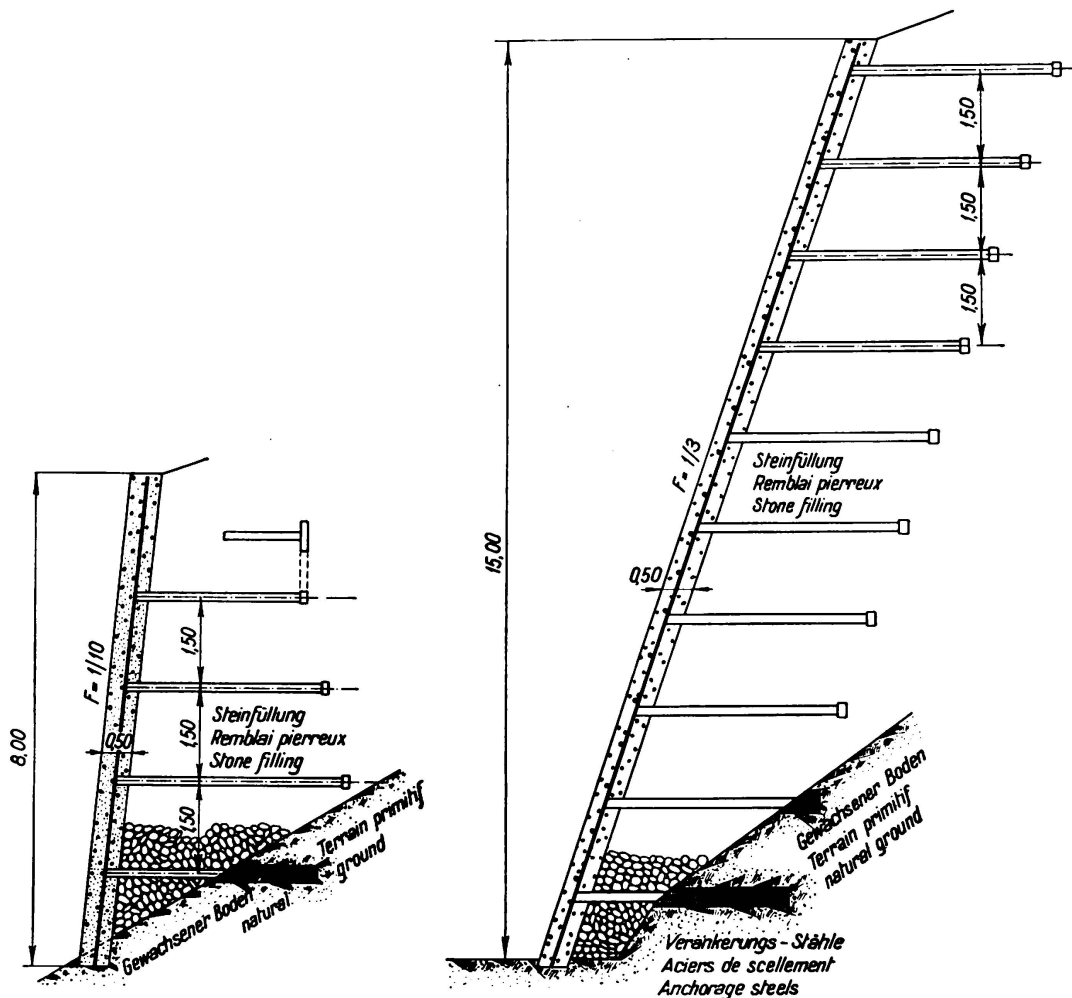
Retaining walls on Coyne's ladder system — Cross sections.
